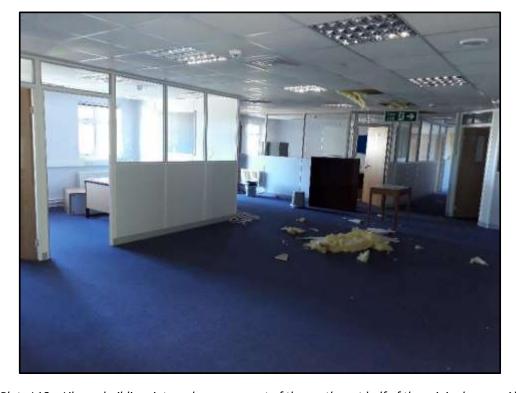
Library building, internal arrangement of the south east half of the original range. All partitions and fixtures are modern
